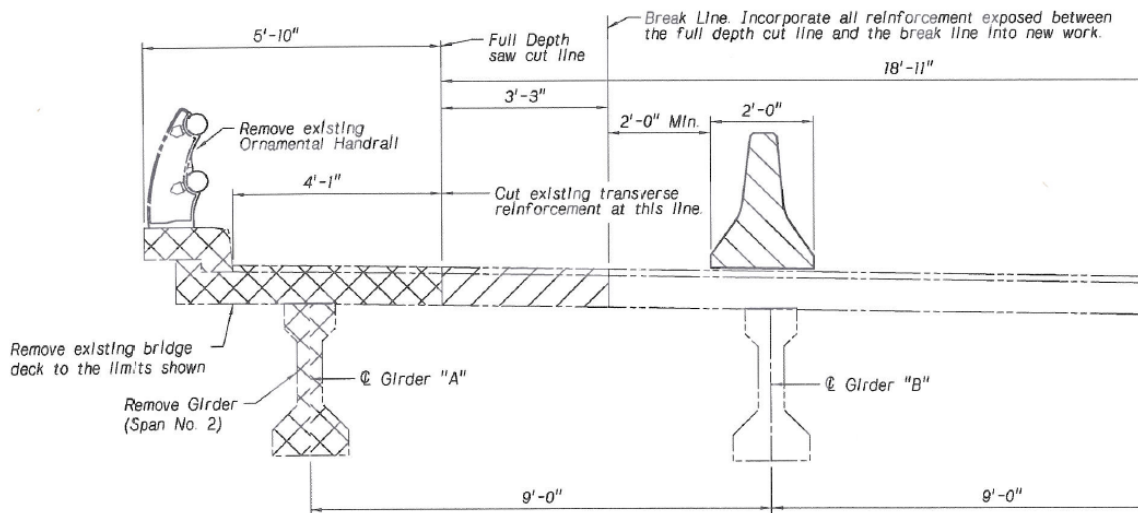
Girder replacement procedure, cross-section to be removed, from the repair documents of I-680 over US-75 Bridge, courtesy of NDOT
